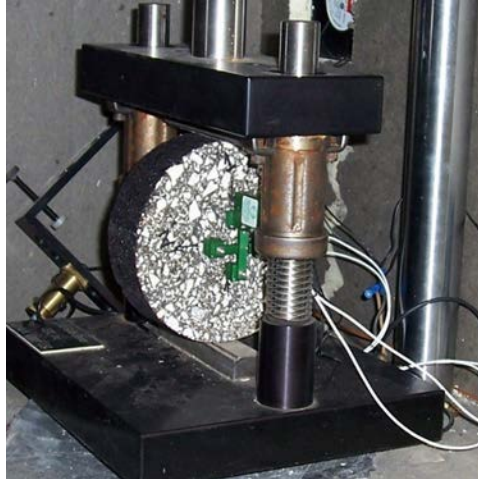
A closer view of the specimen mounted with the gauge points in the test specimen loading frame
